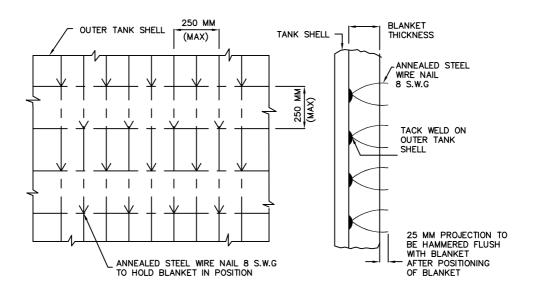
DETAIL FOR FIXING OF WIRENAILS FOR HOLDING INSULATION BLANKETS
